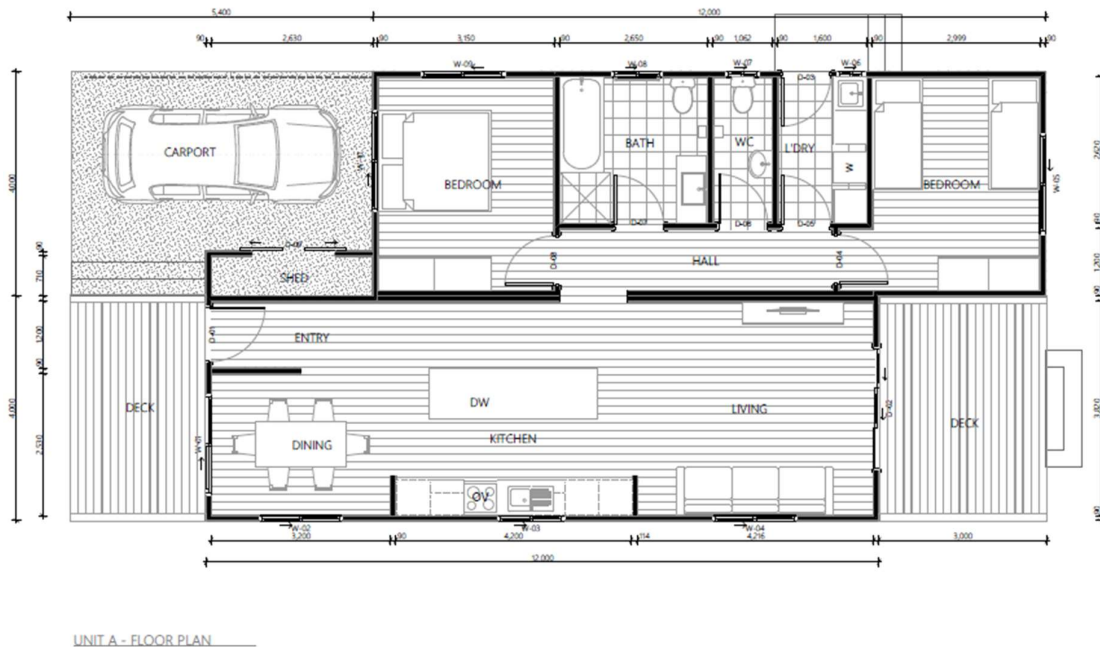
Proposed floor plan and works for 71 Woore Street, Wilcannia – 2 dwellings.
